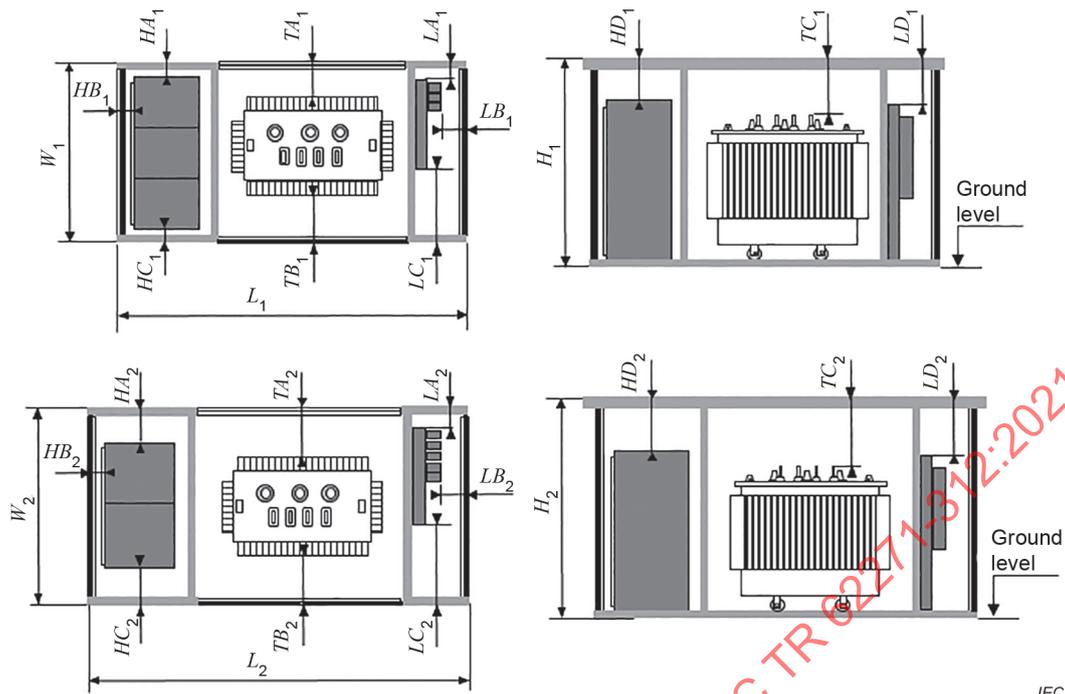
Prefabricated substation not acceptable alternative layouts
